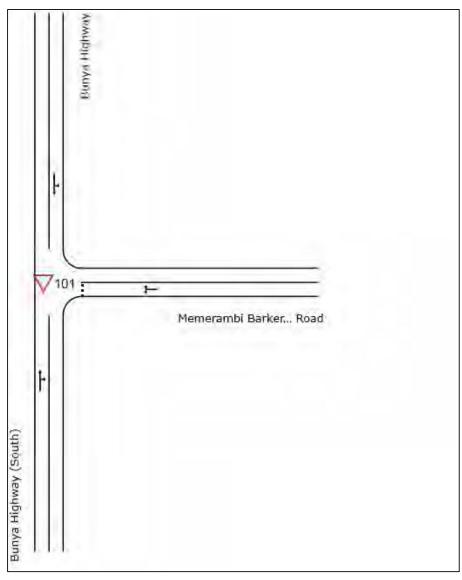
Bunya Highway / Memerambi Barkers Creek Road intersection SIDRA layout
